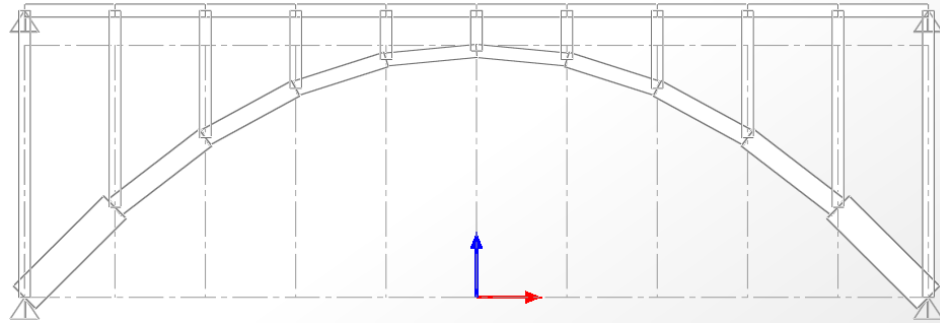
Elevation with eleven columns (actual elevation of the Woronoco Bridge).
